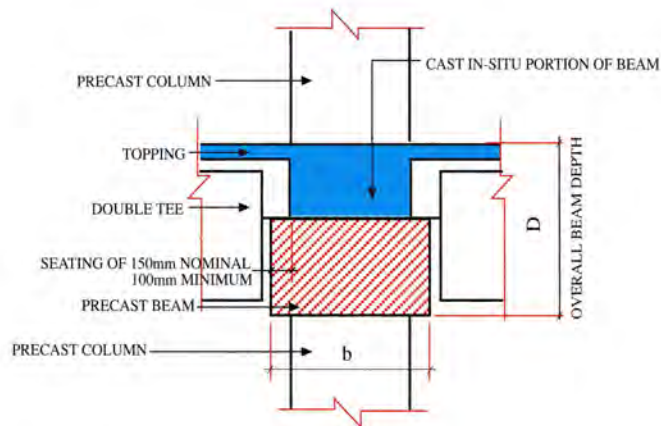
DOUBLE TEE BEAM-SLAB ON PRECAST BEAM
